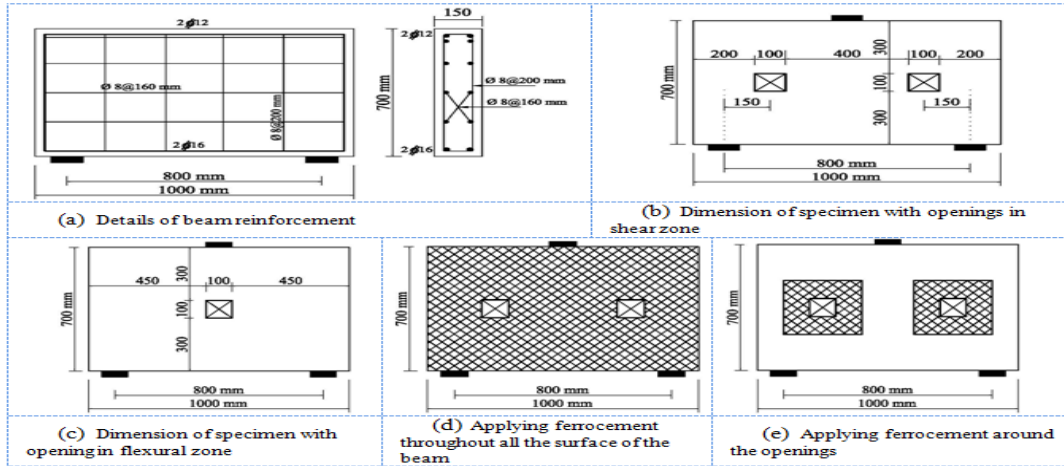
DIMENSIONS, REINFORCEMENT DETAILS, AND STRENGTHENING SCHEMES OF THE TEST SPECIMENS.
